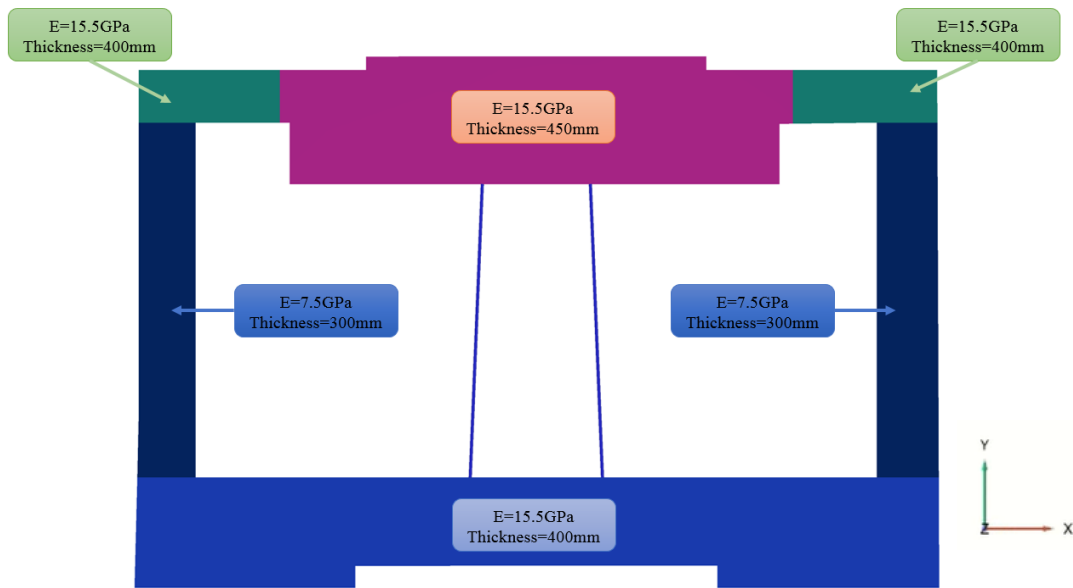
Ground floor slab/temporary propping properties (plan view)
